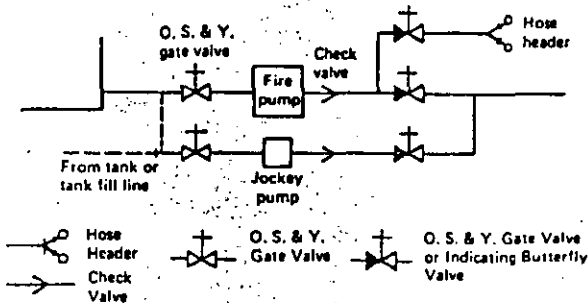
Jockey Pump Installation with Fire Pump.
